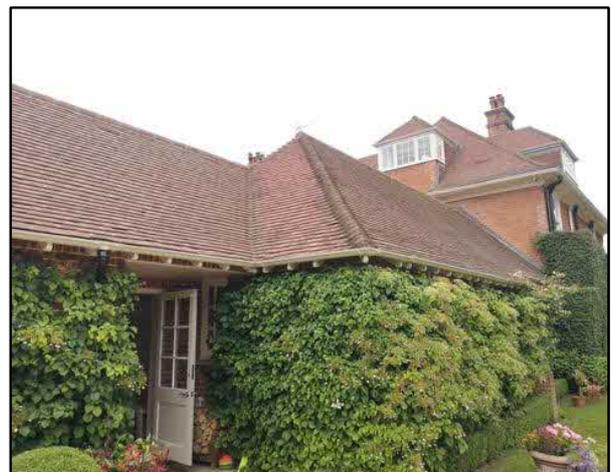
A view looking at the south and east elevations of the pool house. The area of plastic roof is visible.
